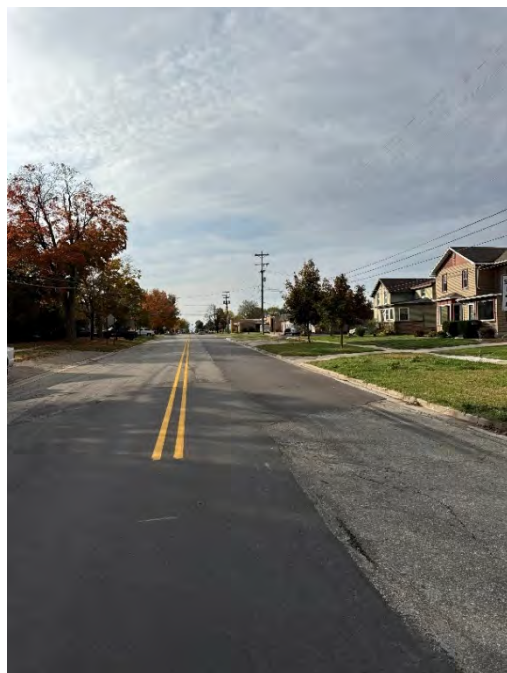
Contract #1 –Construction at N. Main Street is completed.
